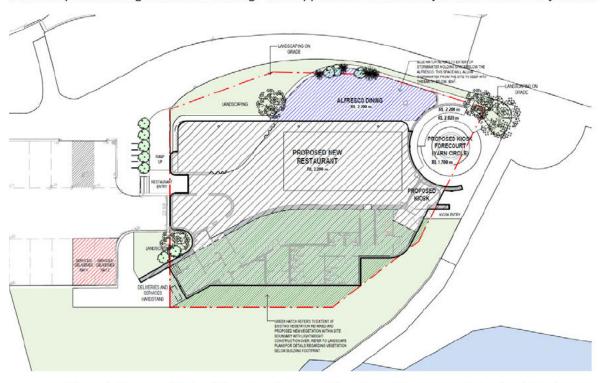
Proposed Raised Construction area (Green) and Stormwater Retention (Blue)
